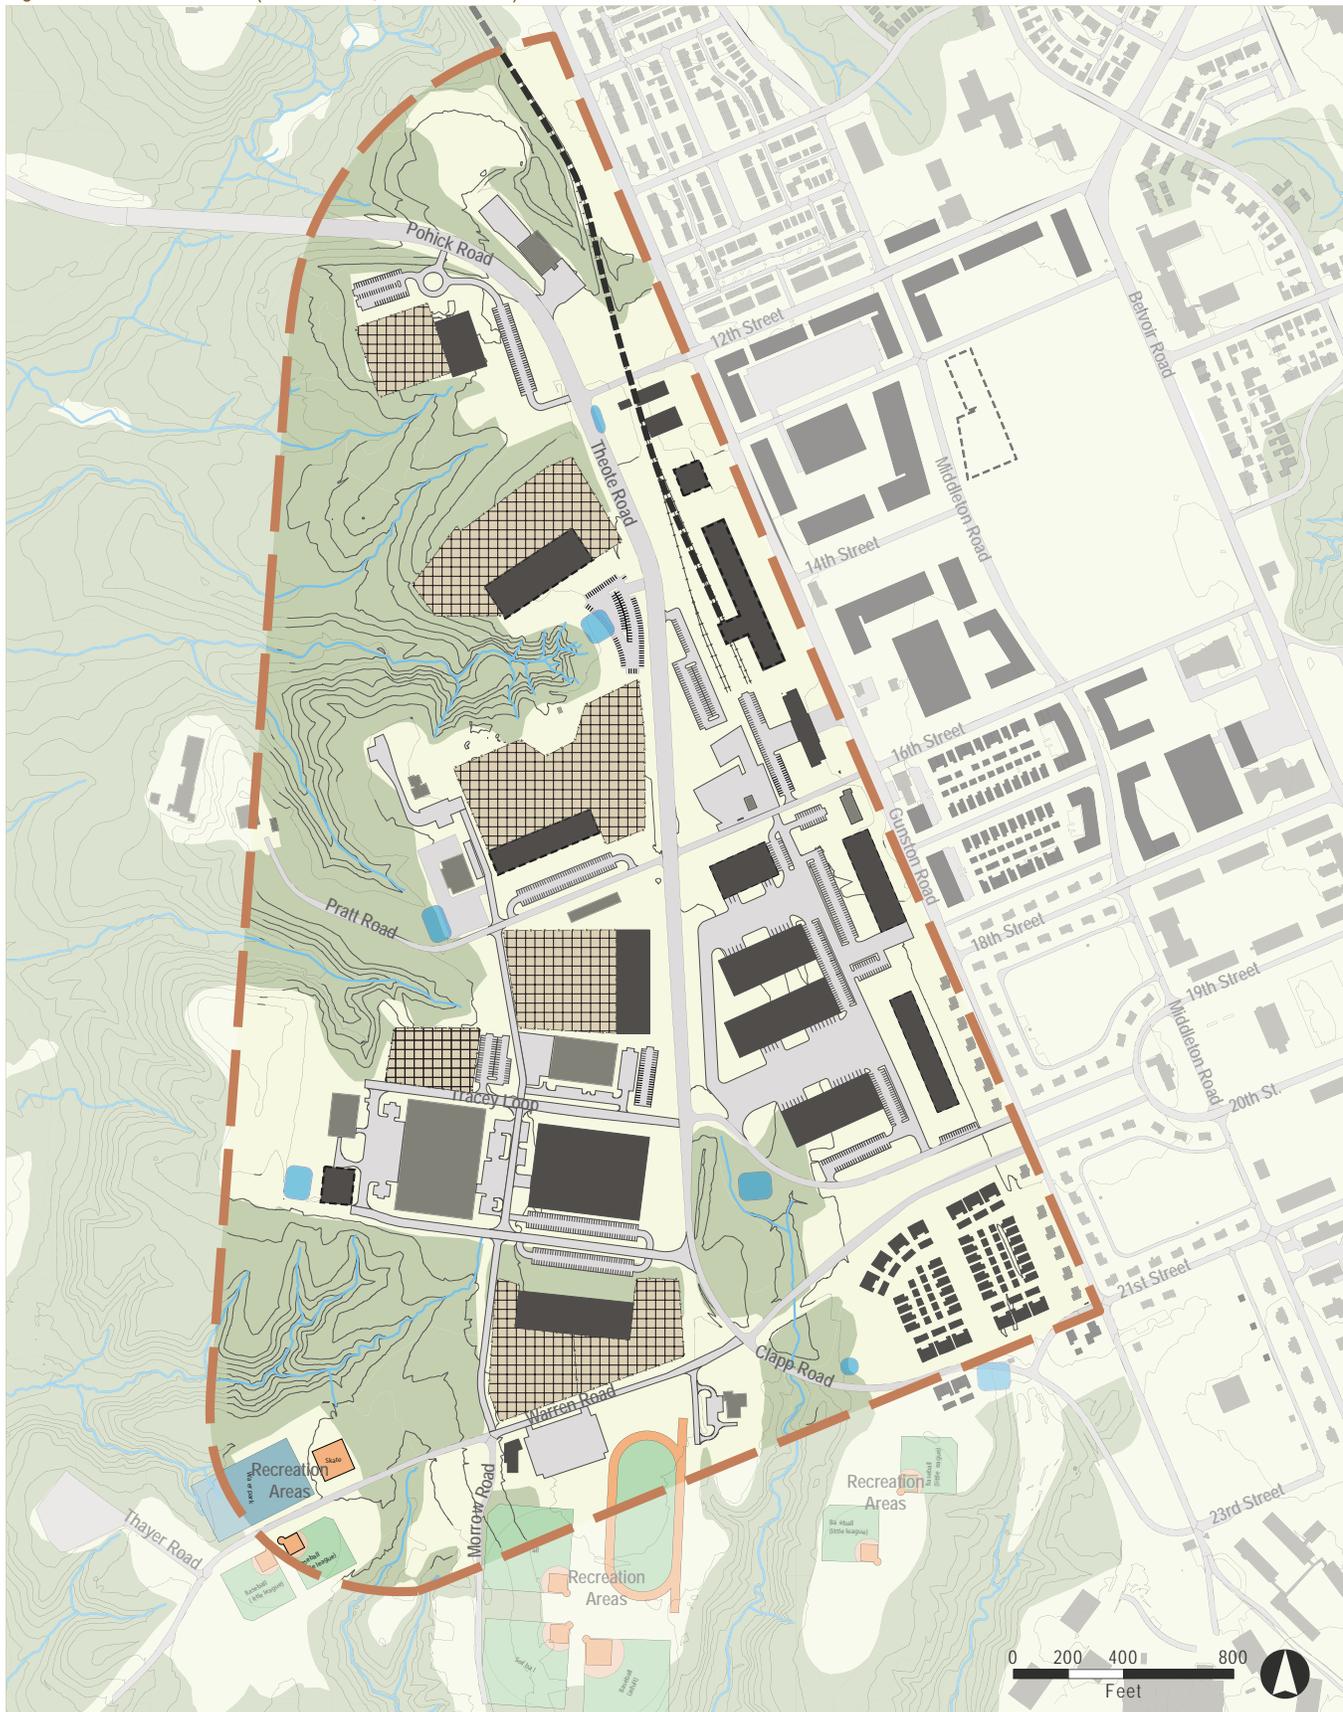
Rendered Plan (full build out, unconstrained)
